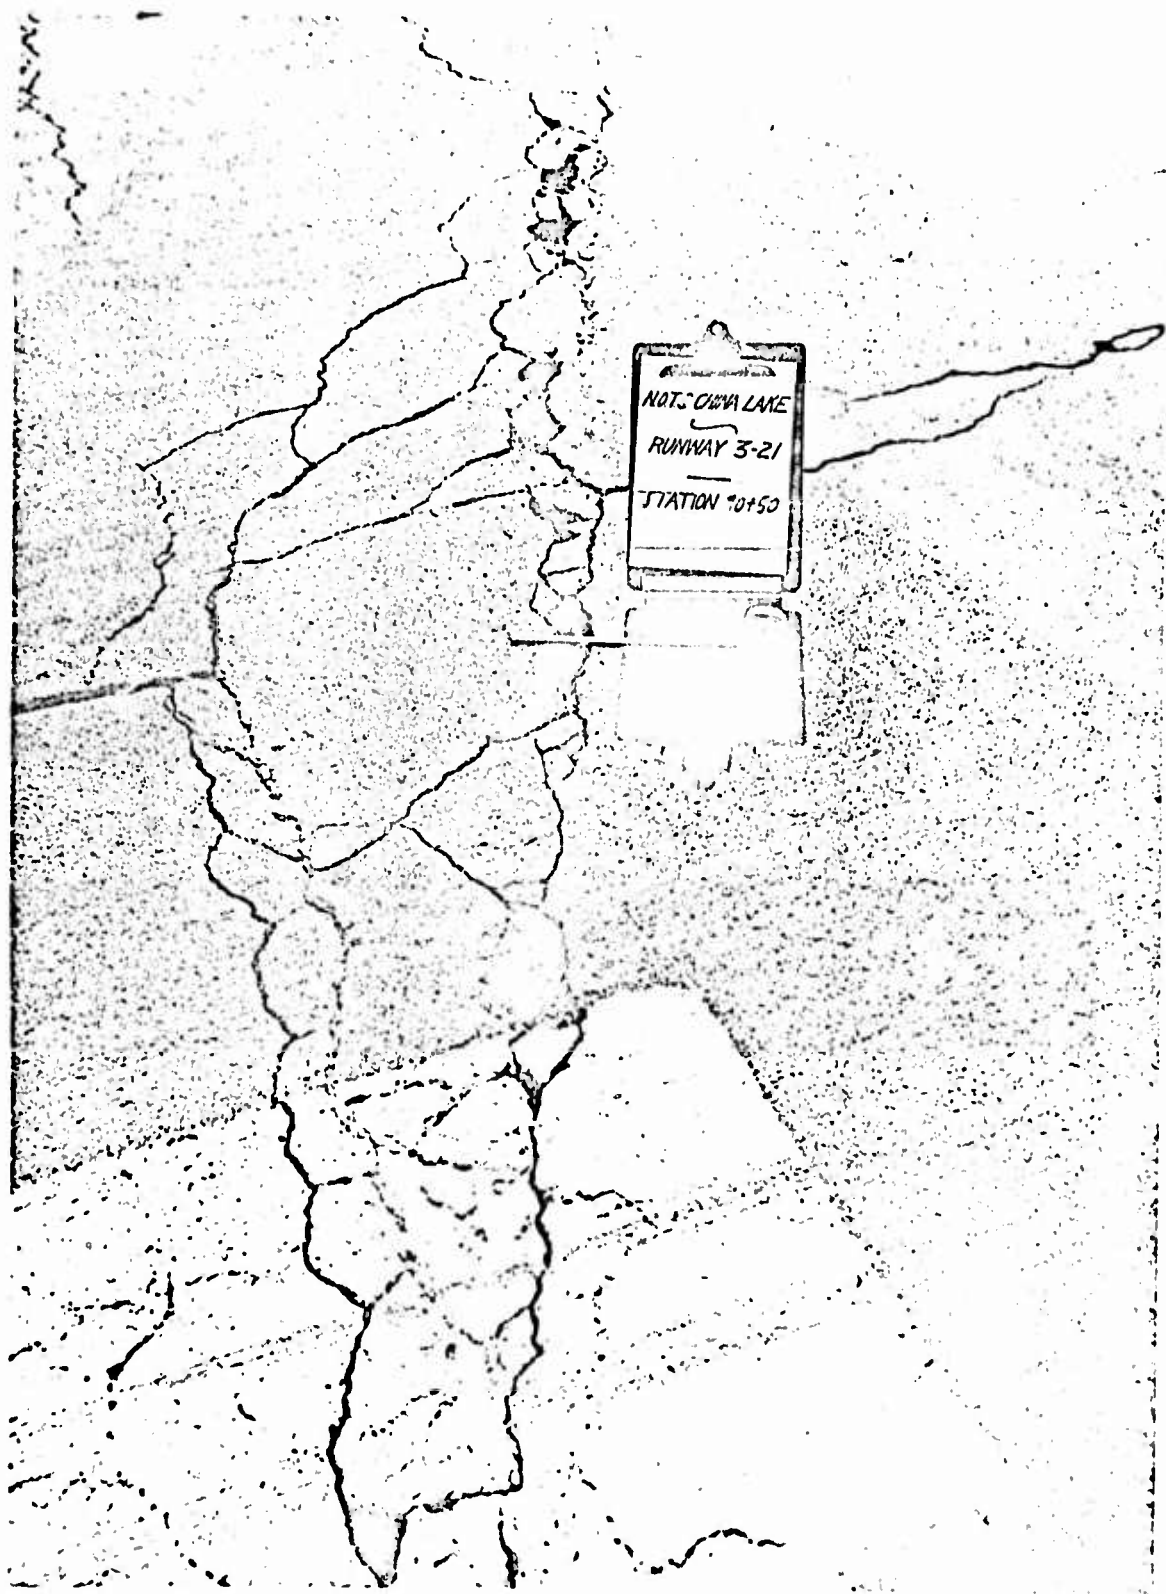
Severe cracking and spalling combined with raveling on Runway 3-21, U. S. Naval Air Facility, China Lake, California. 43
